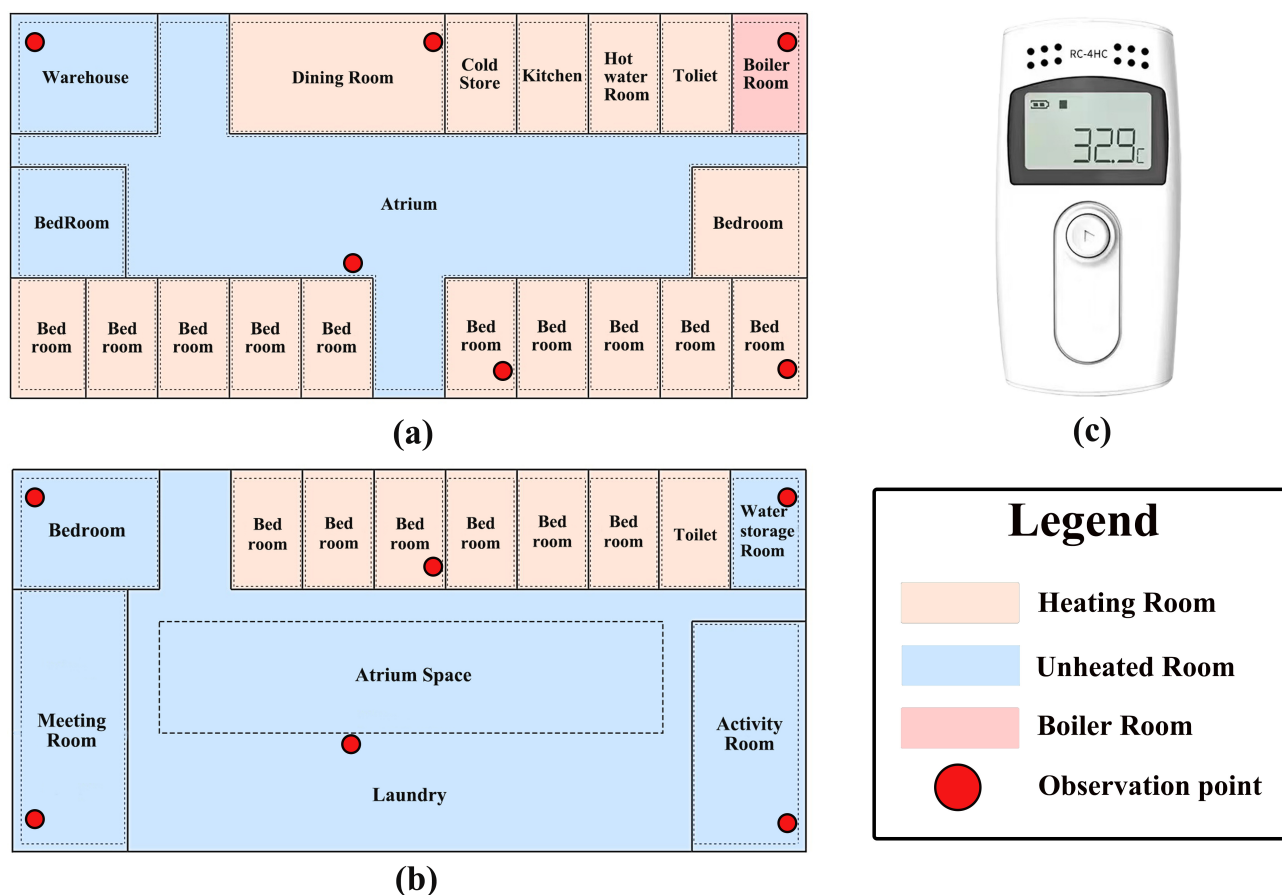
Room function, heating conditions, and monitoring point locations. (a) First floor; (b) second floor; (c) monitoring equipment.
